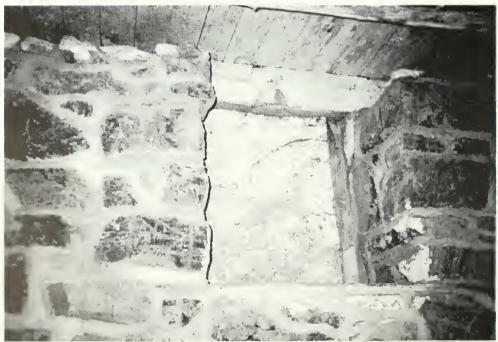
A typical opening (at the northeast elevation) eovered over with sheet metal.
